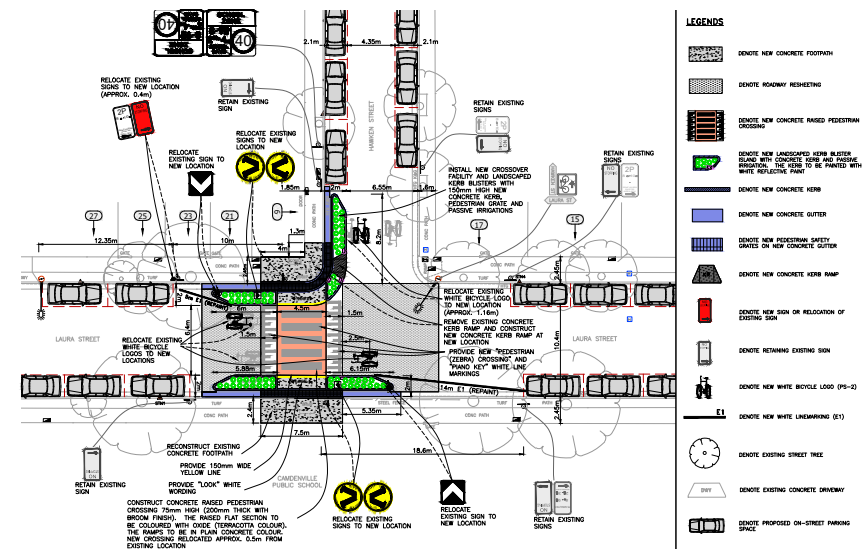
Laura Street between Edgware Road and Hawken Street
